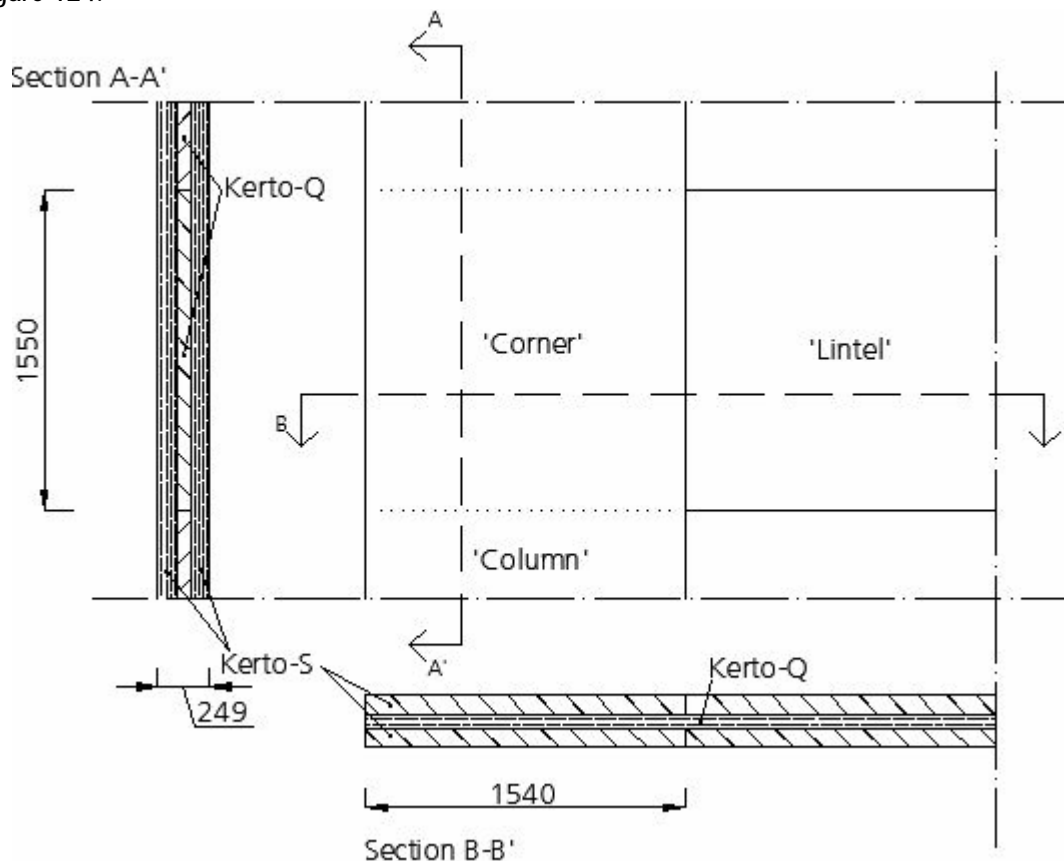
Connection of a 'lintel' to an adjacent 'column'
